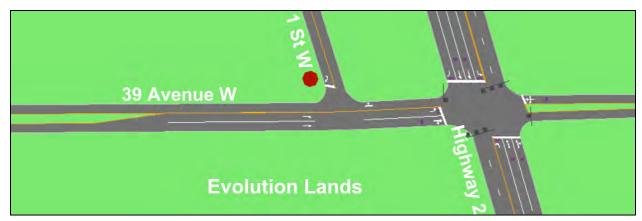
39 Avenue W / 1 St W Recommendation
